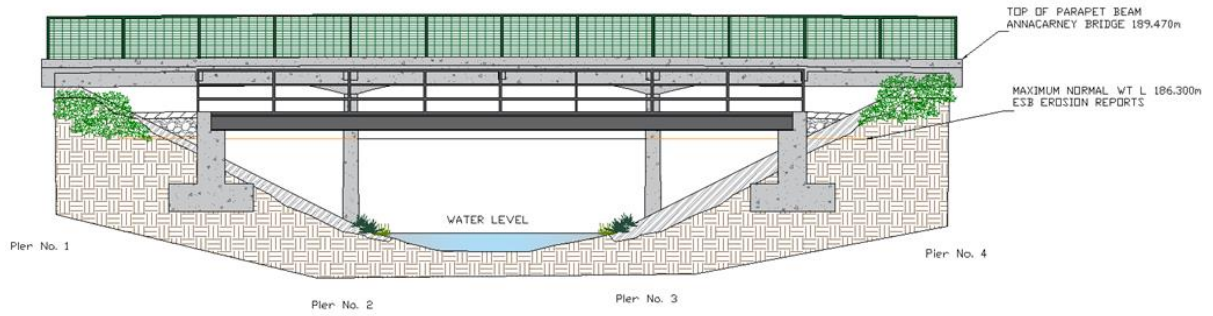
Section showing proposed new greenway bridge with existing Annacarney road bridge in background (Subject to separate Section 50 approval process)
